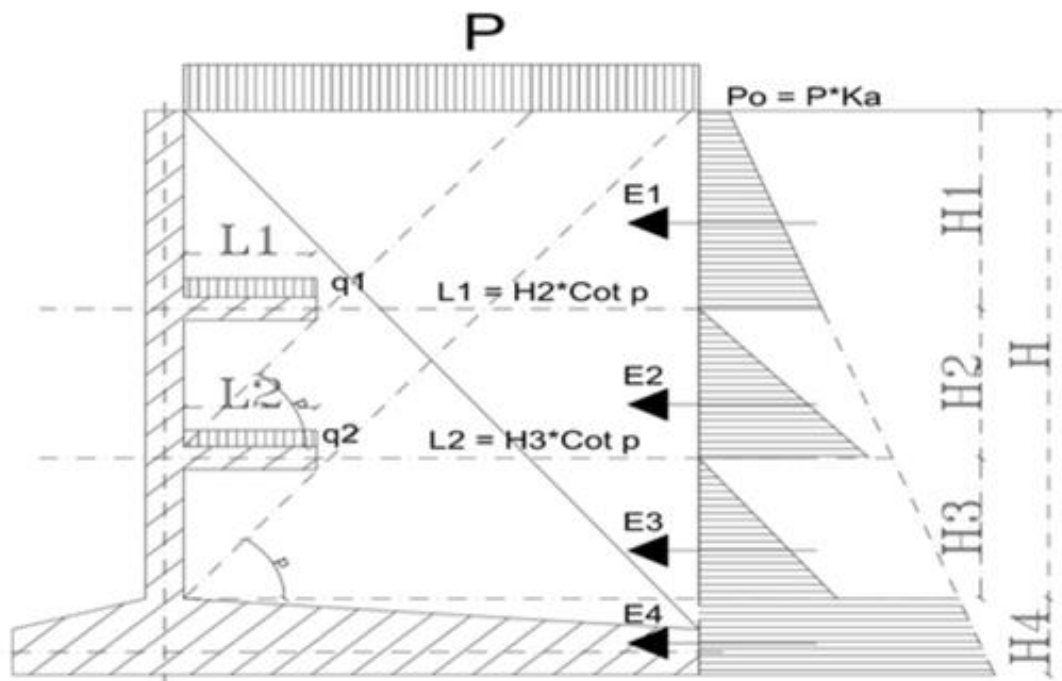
Idea of a counterfort retaining wall with two relief shelves
